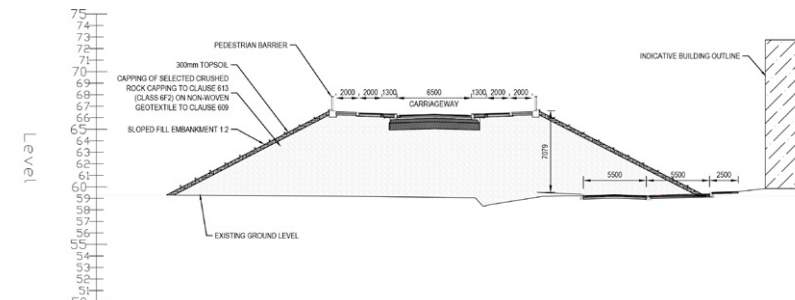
SECTION BB - EXTENT OF EMBANKMENT
